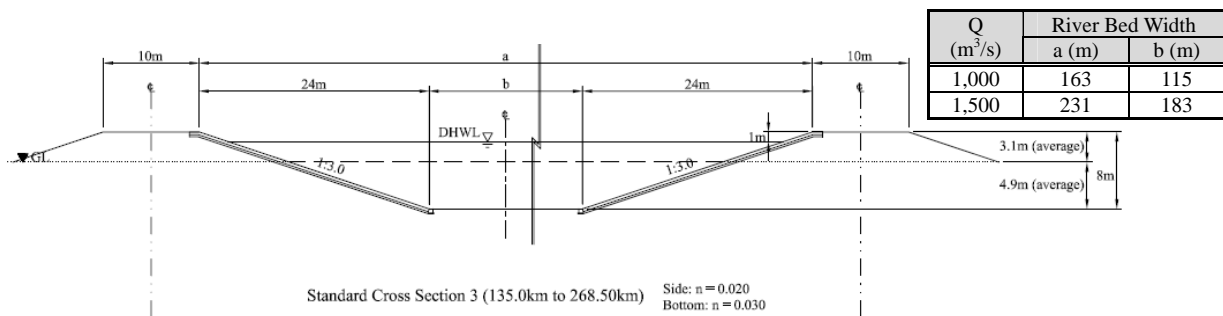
Standard Cross Section of East Diversion Channel with Slope Protection (135km to Diversion Point)
